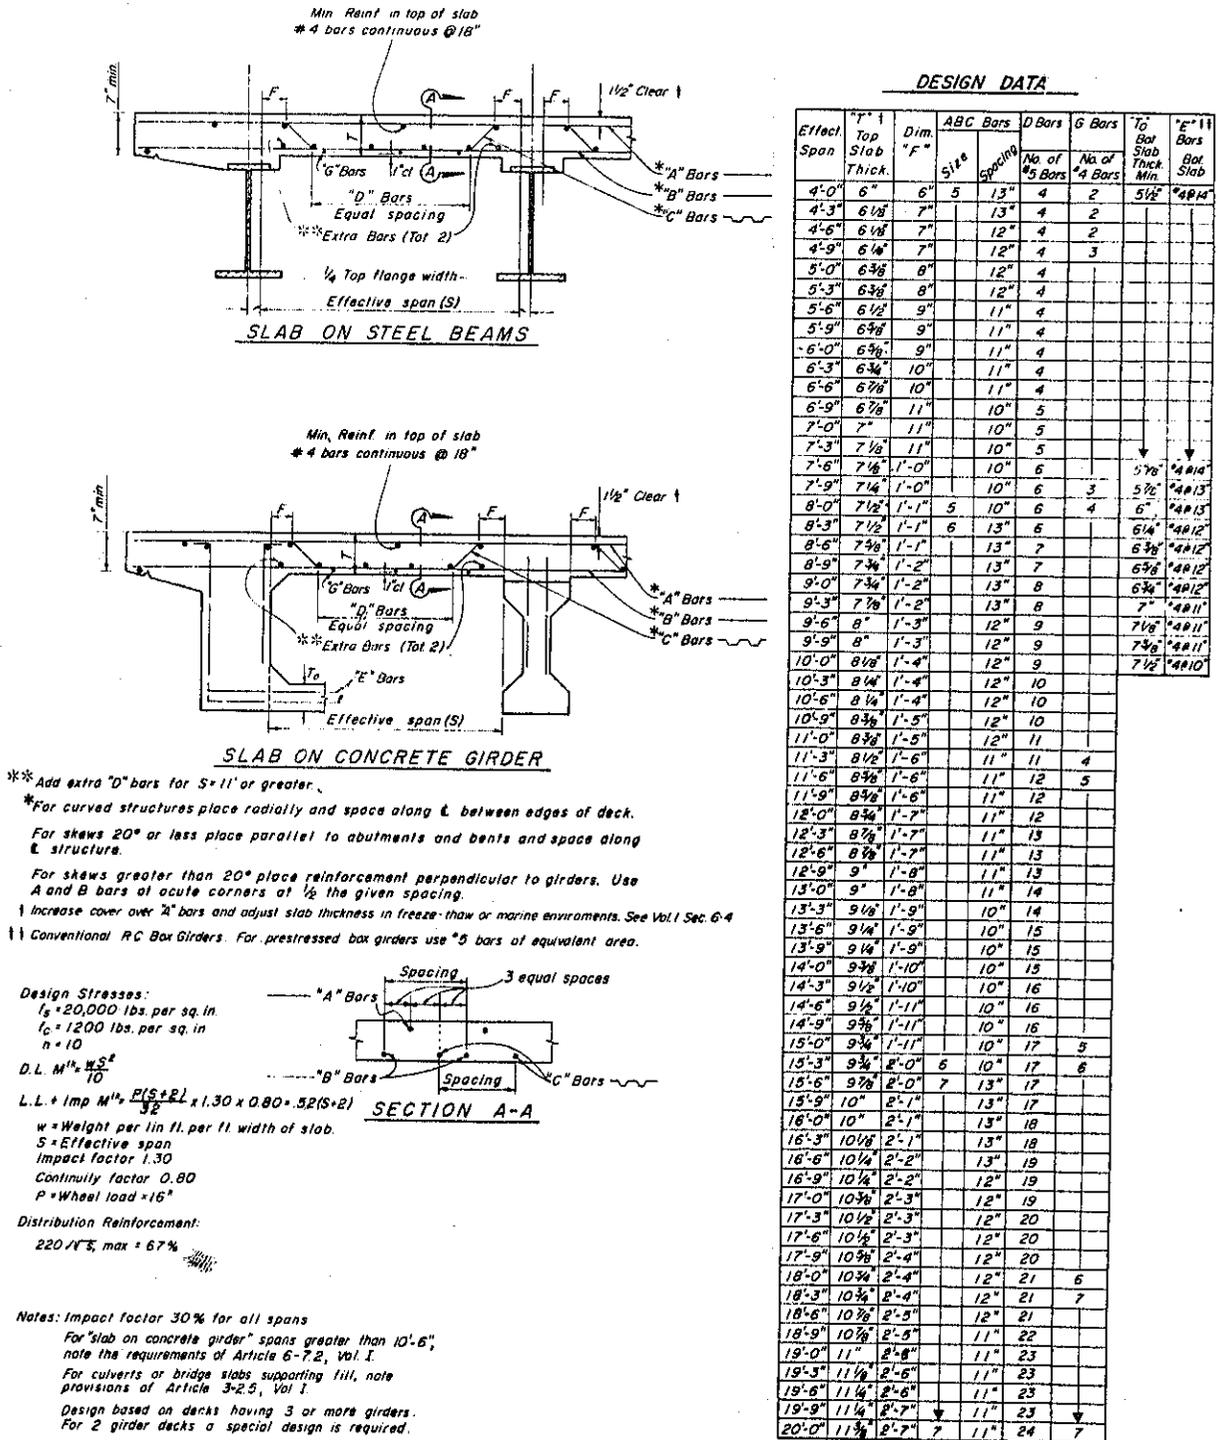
Size and position of reinforcing steel in a typical bridge deck.
